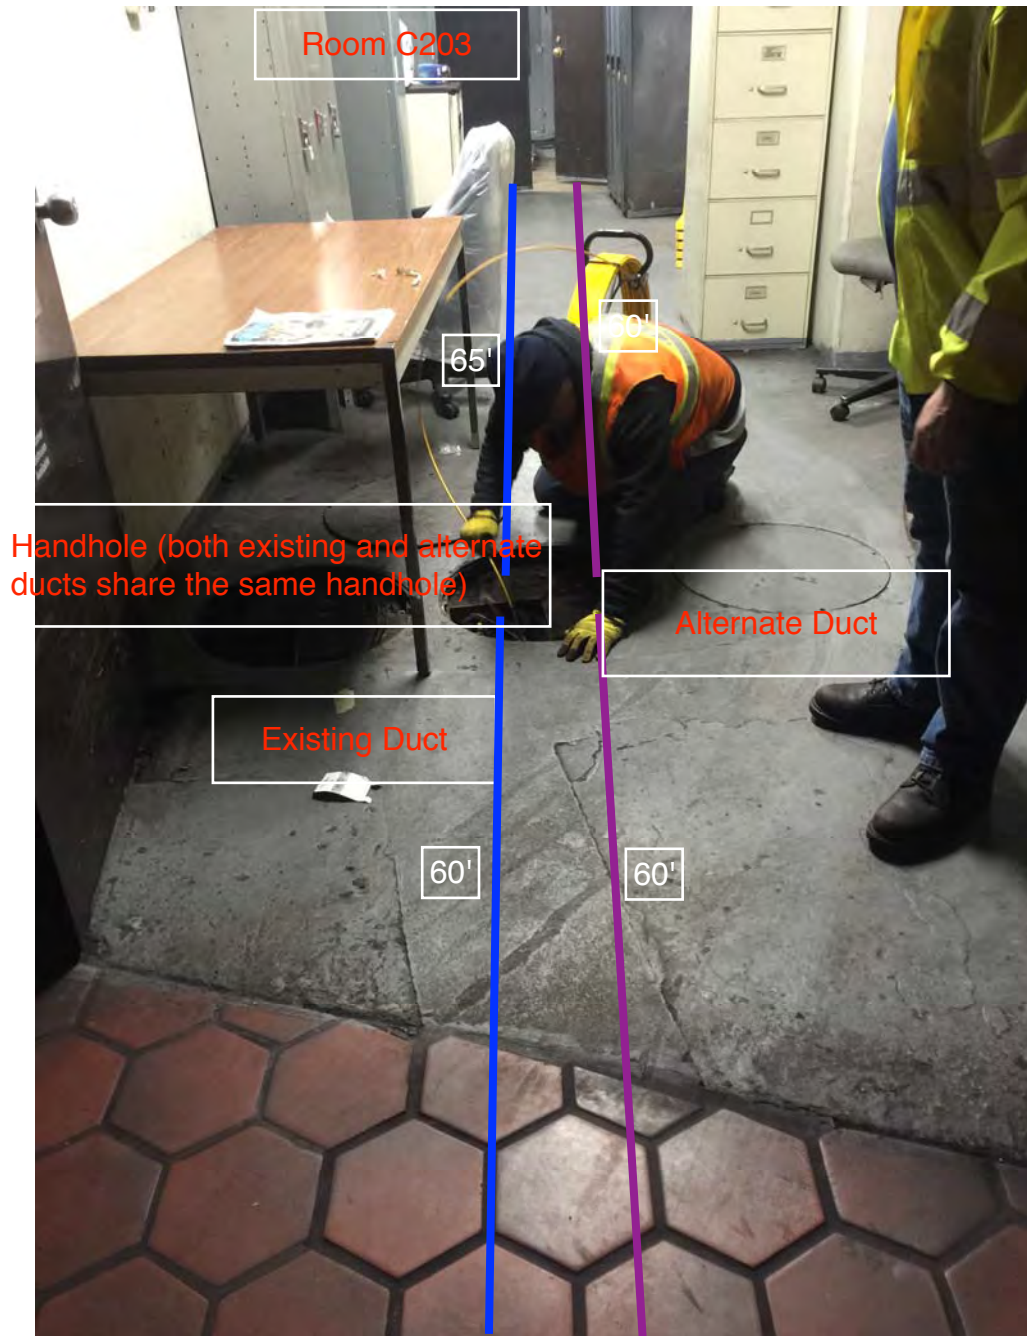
Existing and alternate duct runs, and proposed overhead conduit from Abandoned Communication Panel to AFC Panel (Room C203)
